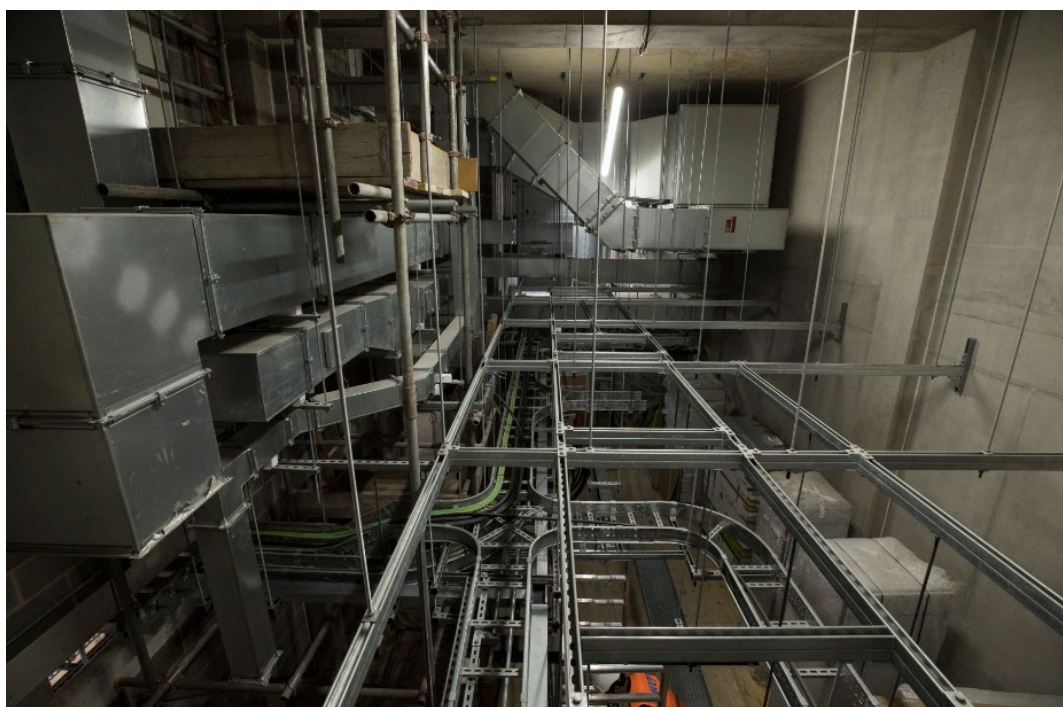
Inside the shaft - Containments to house mechanical and electrical equipment
